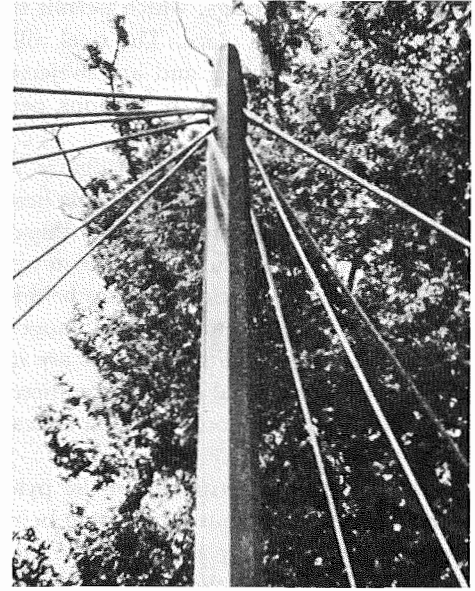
Schillerstrasse Footbridge, view of anchorage at tower. (Courtesy of Die Bautechnik, from reference 21.)
